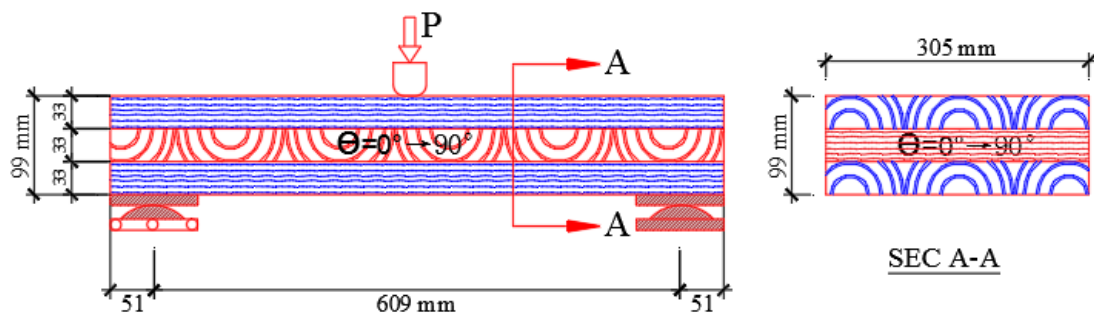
Longitudinal and Cross Section of CLT Floor Panel
